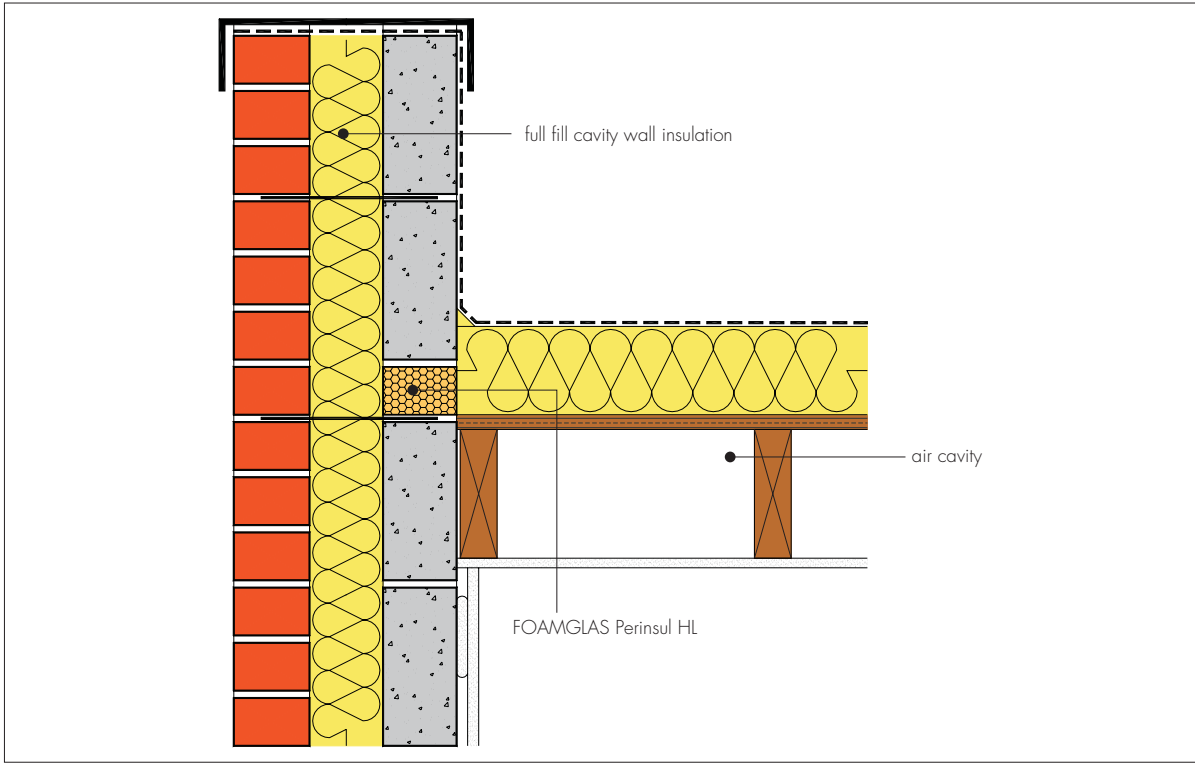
Flat roof with parapet and warmdeck — insulation above joists
